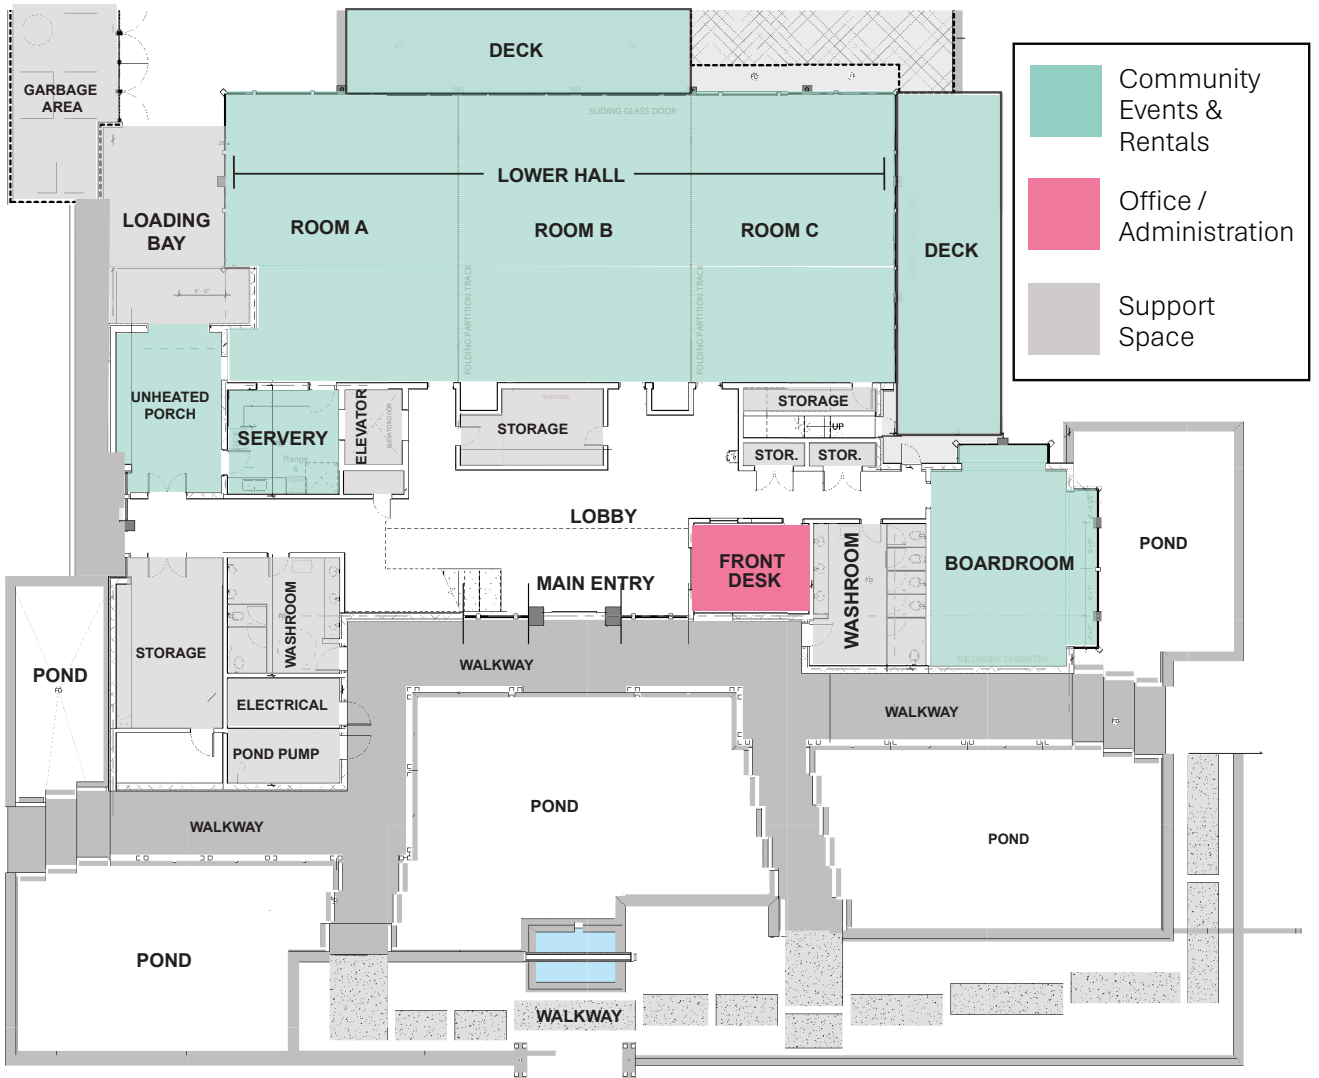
Gorge Park Pavilion Floor Plan – Second Floor
